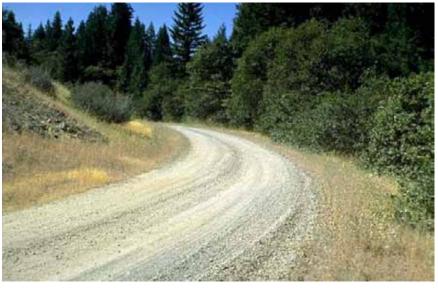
An outsloped single-lane road template, directing flow to and off the downhill shoulder.
